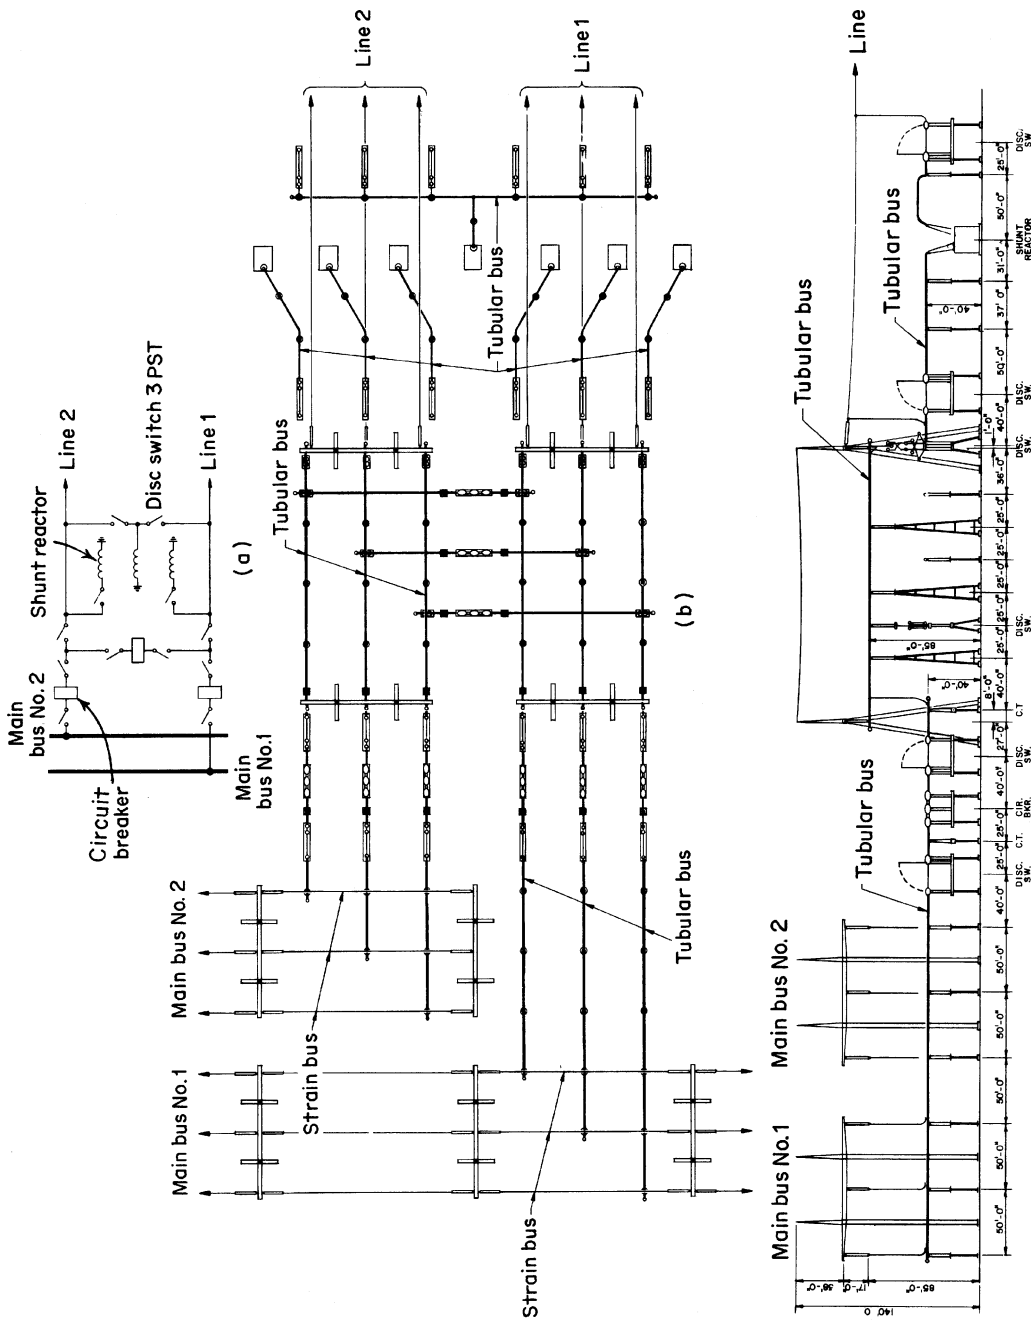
A 765-kV substation using both rigid- and strain-bus design. (a) Main one-line diagram; (b) plan; (c) elevation.
